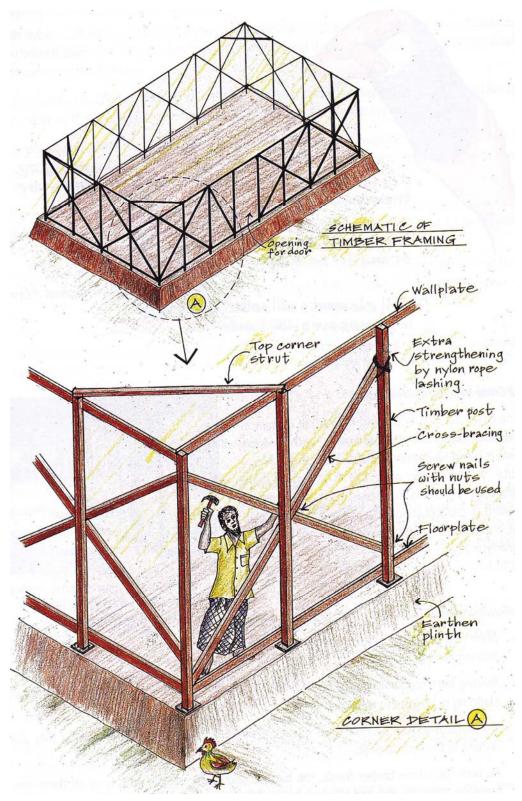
Techniques of cross-bracing of wall frameSource: Improved Design and Construction of Rural Housing in Noakhali ,IUCN,2008
